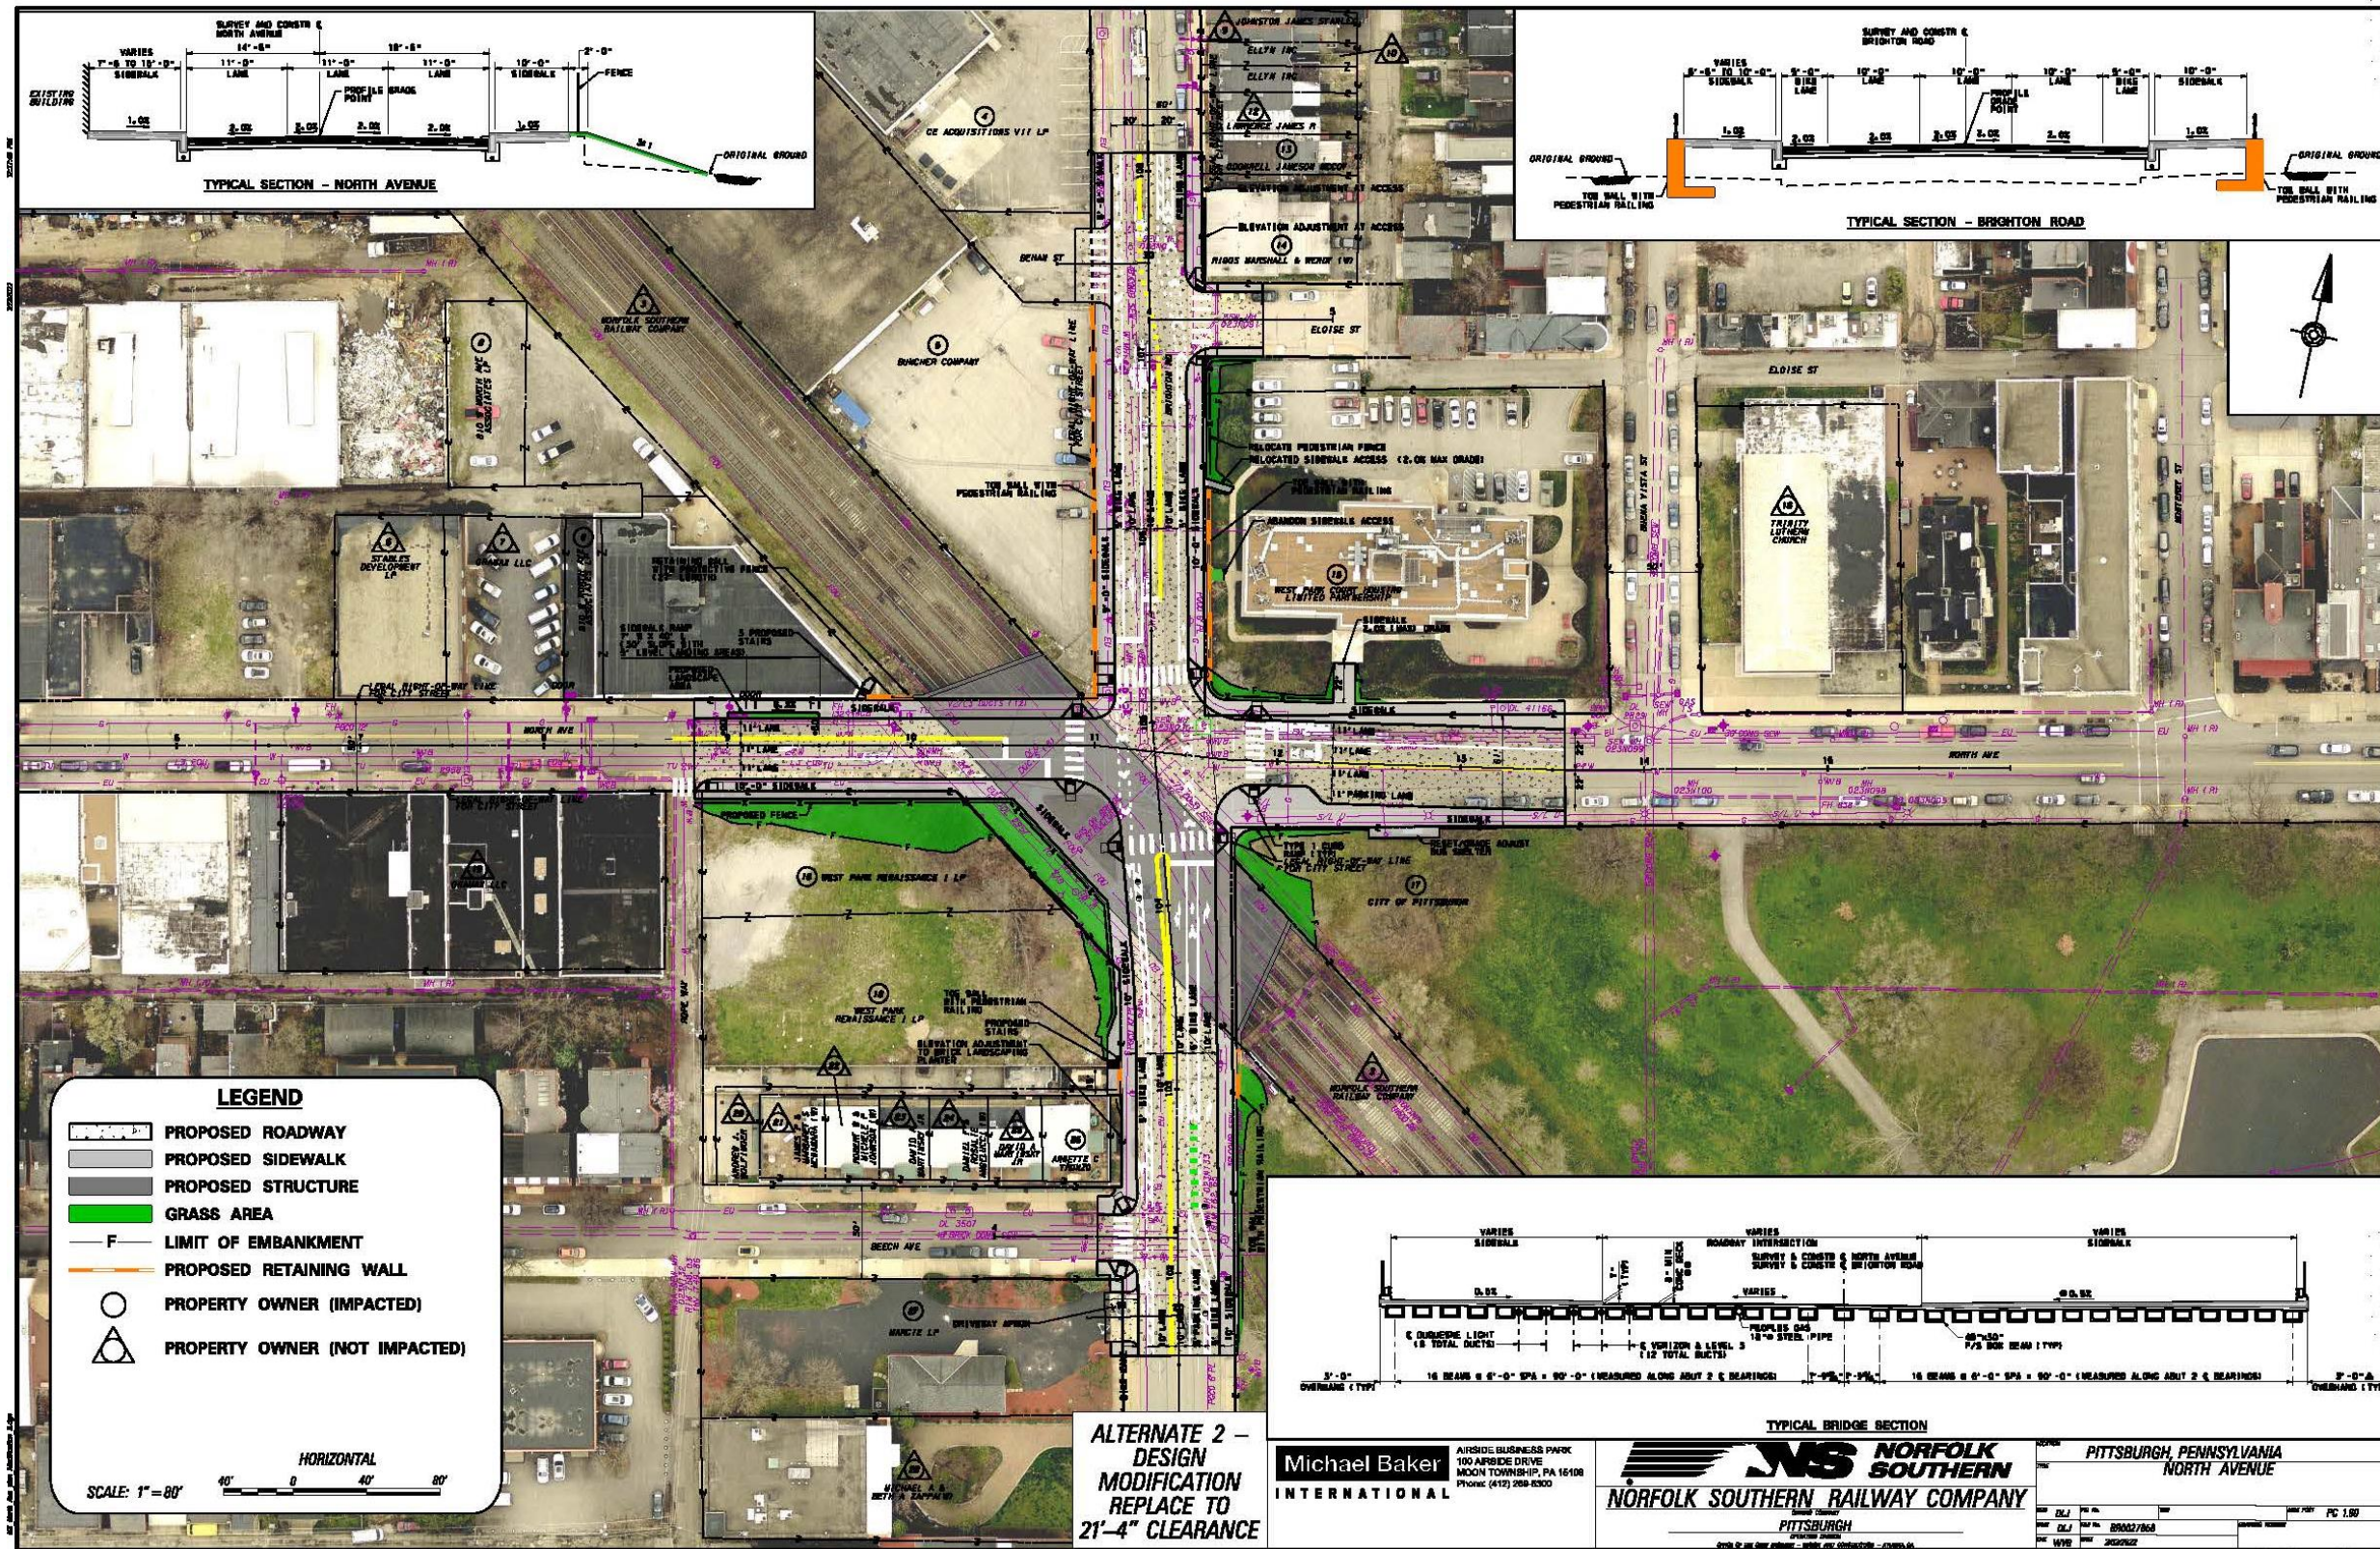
Plan and profile views showing the proposed bridge structure and changes to the roadway, and sidewalks.
